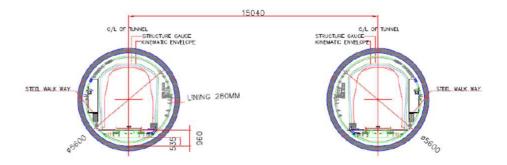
Cross-Section of Bangalore Metro Underground Tunnel (Sudhir Chandra, 2013)
